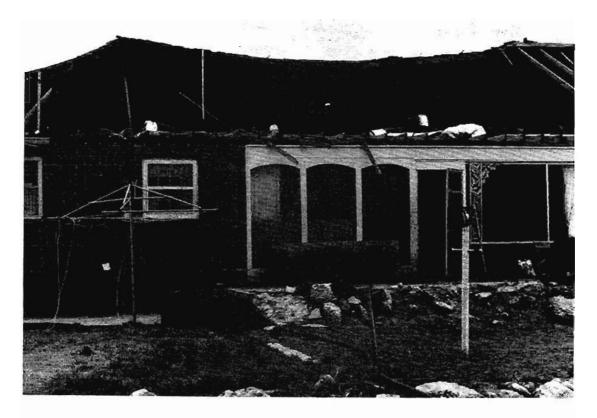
TRADITIONAL METHODS OF CONSTRUCTION IN SPECIFIC CITIES ARE REVEALED WHEN A WIND EVENT OCCURS. Roof framing schemes involving only rafters are traditional in Plainview, Texas; this construction procedure invites failure of entire roof segments.
